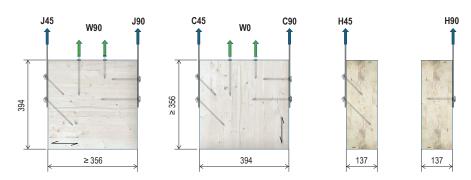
Test configurations for STS tests at various installation and loading angles (mm).
